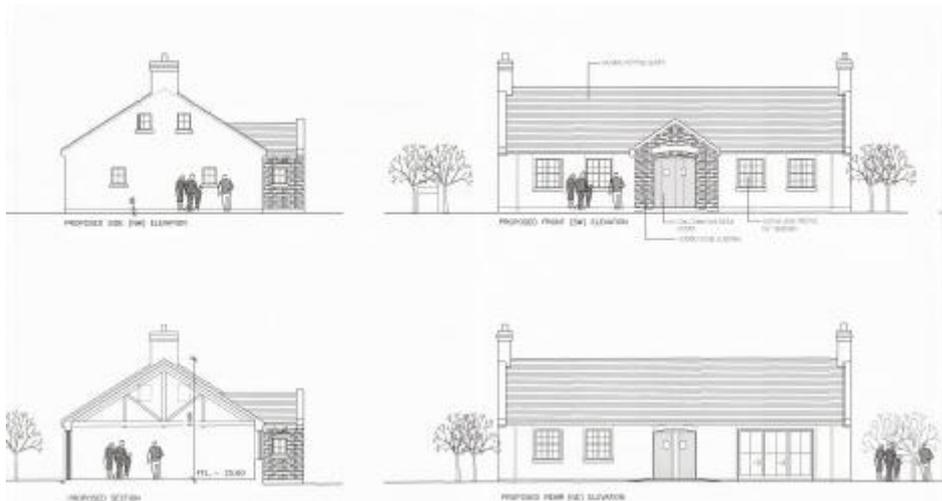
shows the elevations for the proposed amenity building. It is considered the building is of appropriate scale and massing to be considered ancillary to the approved fishery.
